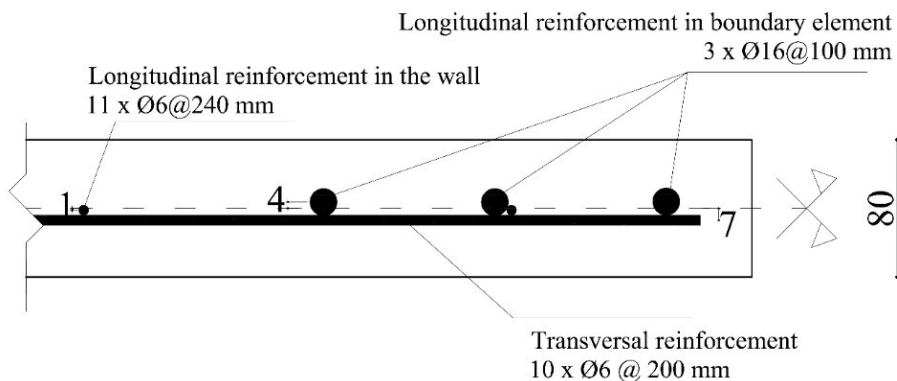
Detail of the cross section of the south edge of the specimen, showing the eccentricity of the vertical reinforcement with respect to the centreline of the section (measure in mm).
